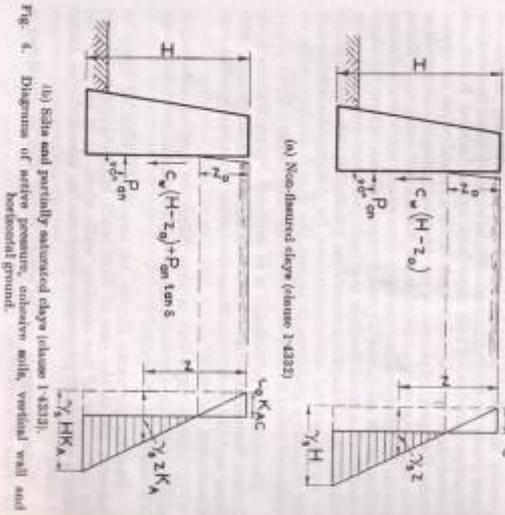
Diagrams of active pressure, cohesive soil, vertical wall and horizontal ground.
